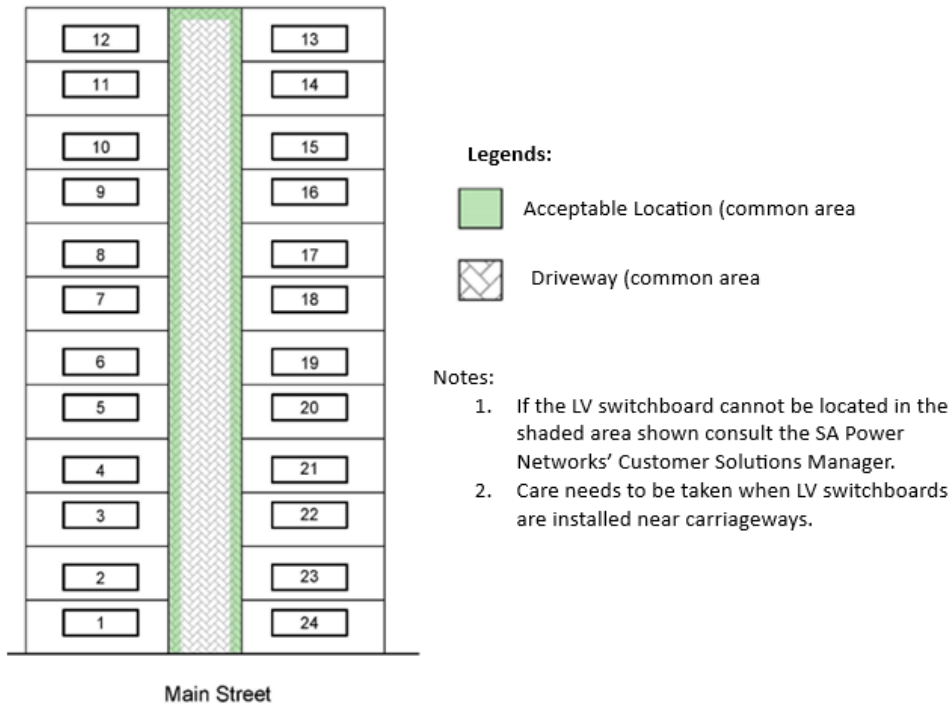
Suitable MSB/group meter positions for domestic and non-domestic installations
